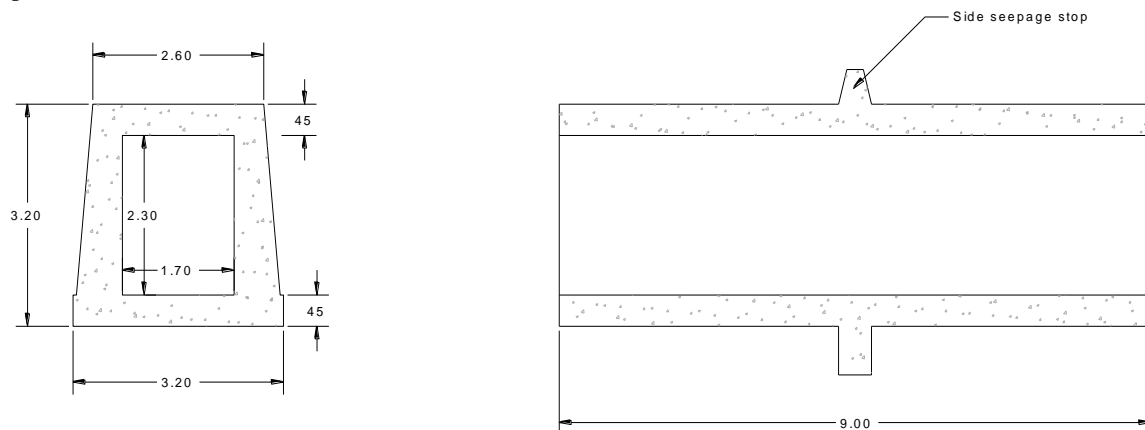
Cross and longitudinal section by bottom discharge (concrete steel)
